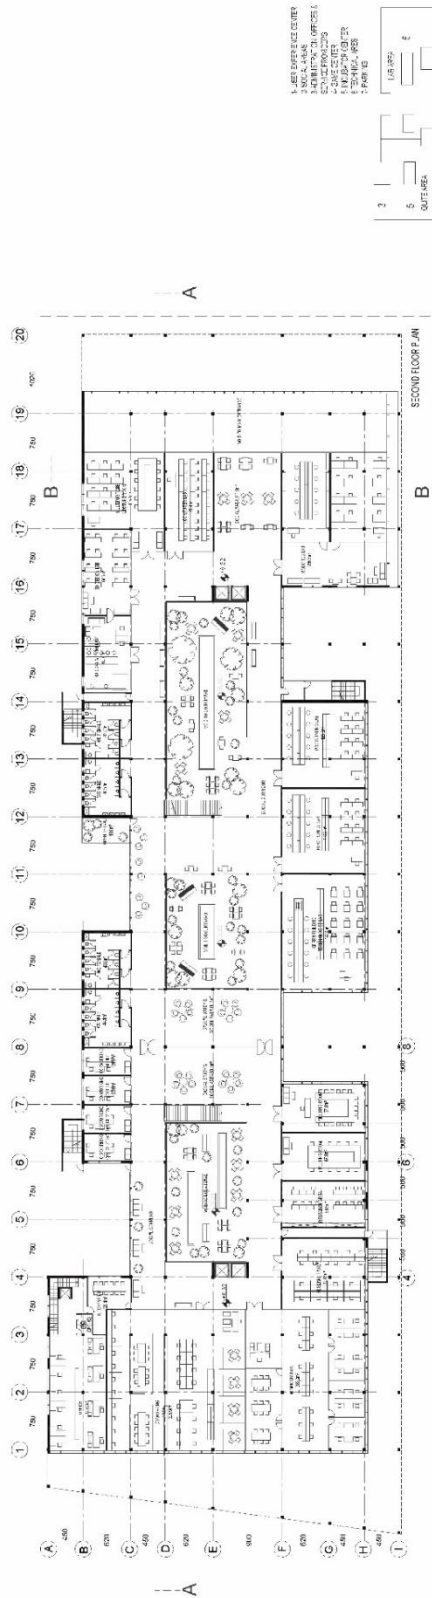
Second floor plan of Antalya Technology of Innovation Center.
